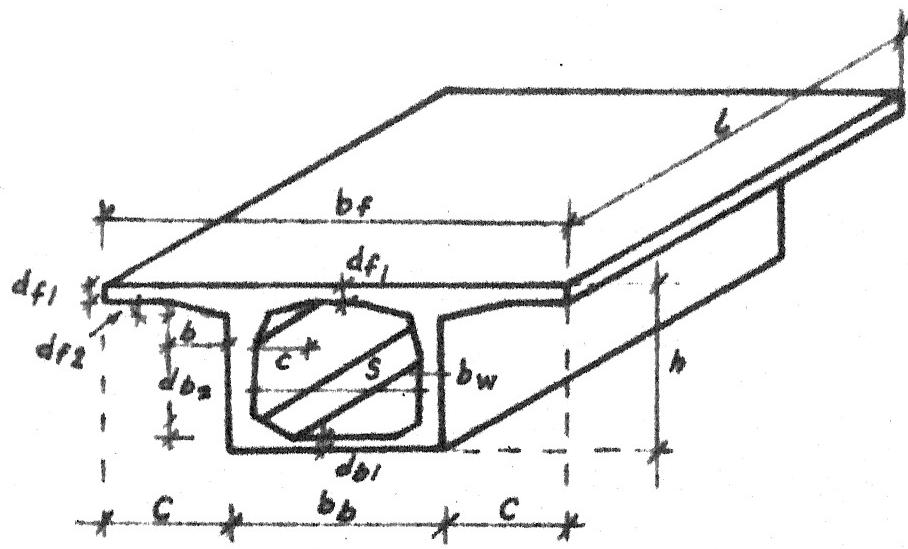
TYPICAL BOX BEAM SEGMENT
